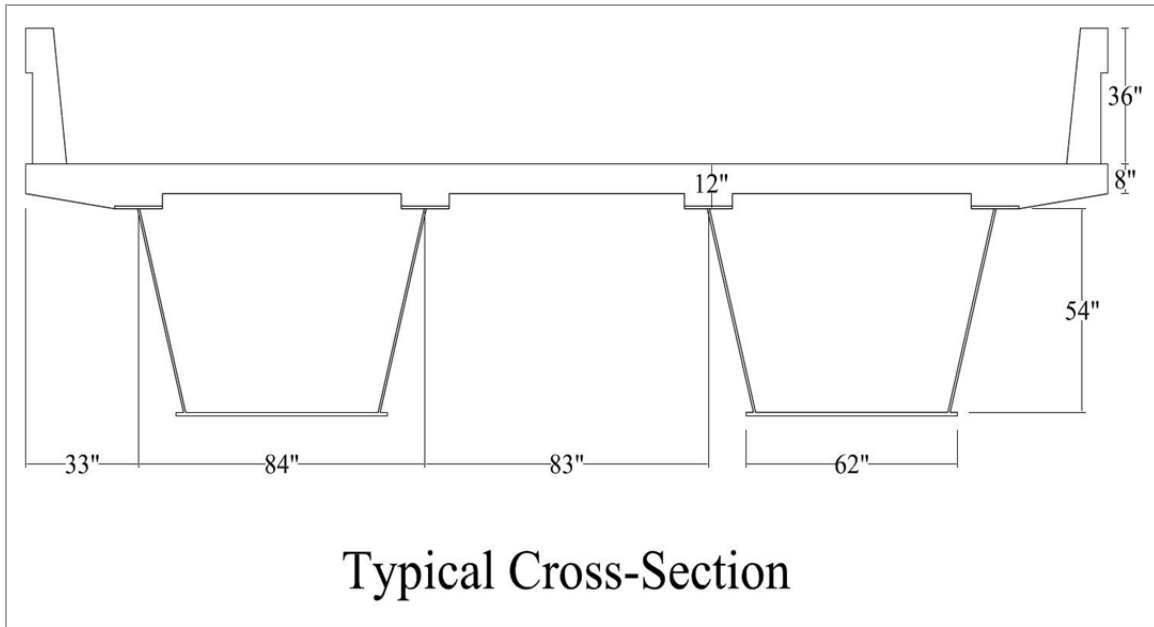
Typical cross-section of spans 17 and 18 of the Woodway Bridge
